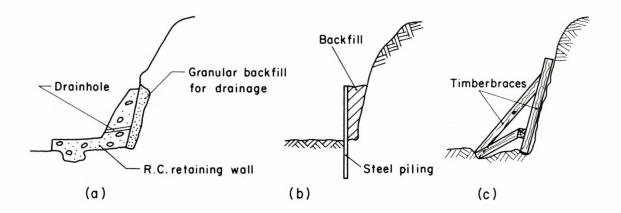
Various types of retaining wall: (a) reinforced concrete; (b) steel piling with backfill; (c) timber braces.
